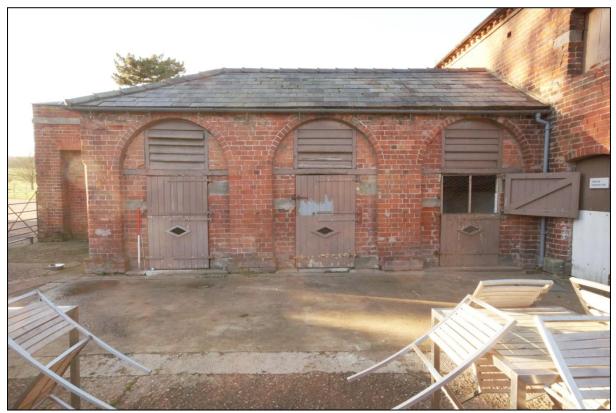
East elevation of Building 16, viewed looking west. Scale = 1m.
